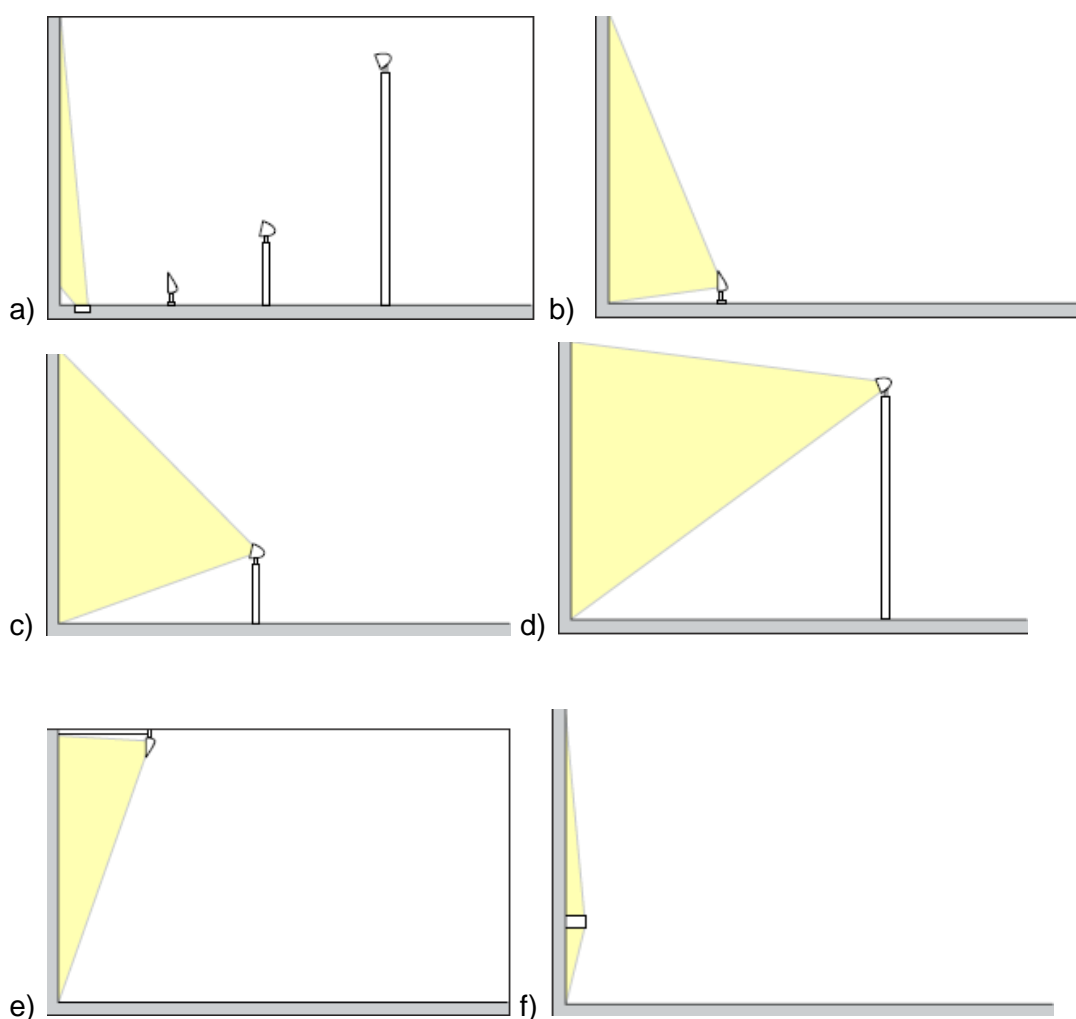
Possibilities for mounting façade lighting: a) floor recessed, b) floor surface, c) on ground with supporting post, d) on mast, e) wall mounted on console, f) directly on wall (Erco, 2012).
